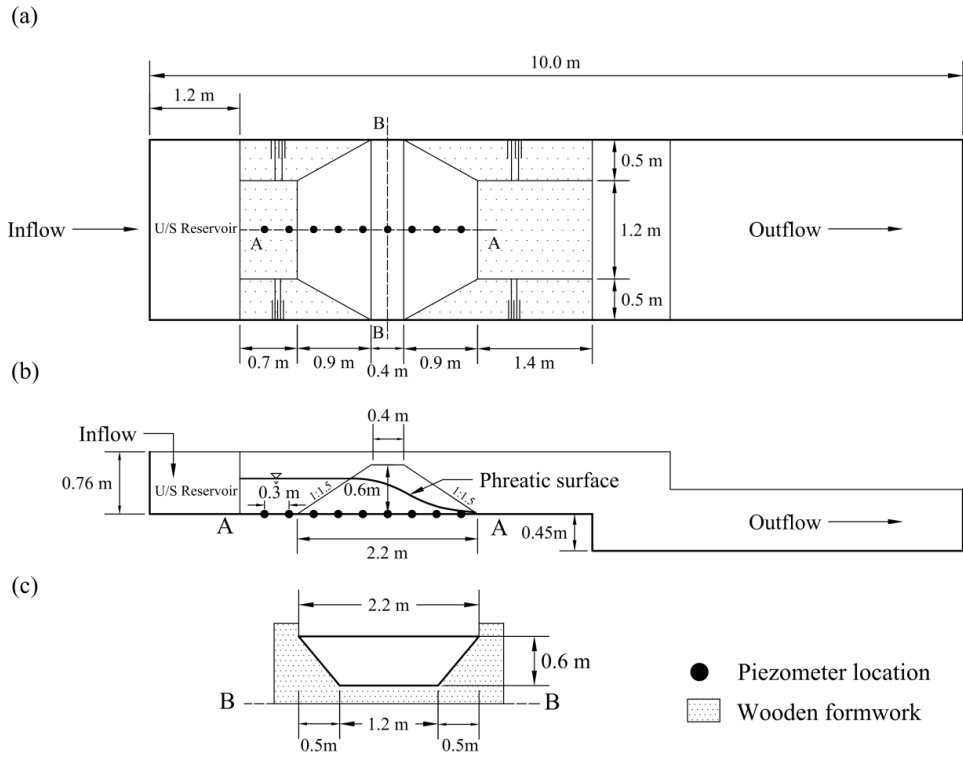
(a) Depiction of the planar design details; (b) Cross-sectional design details (along axis A-A); (c) Longitudinal-sectional design details (along axis B-B) of the 0.6 m test rockfill dam (M2) constructed at the hydraulic laboratory of NTNU, Trondheim.
